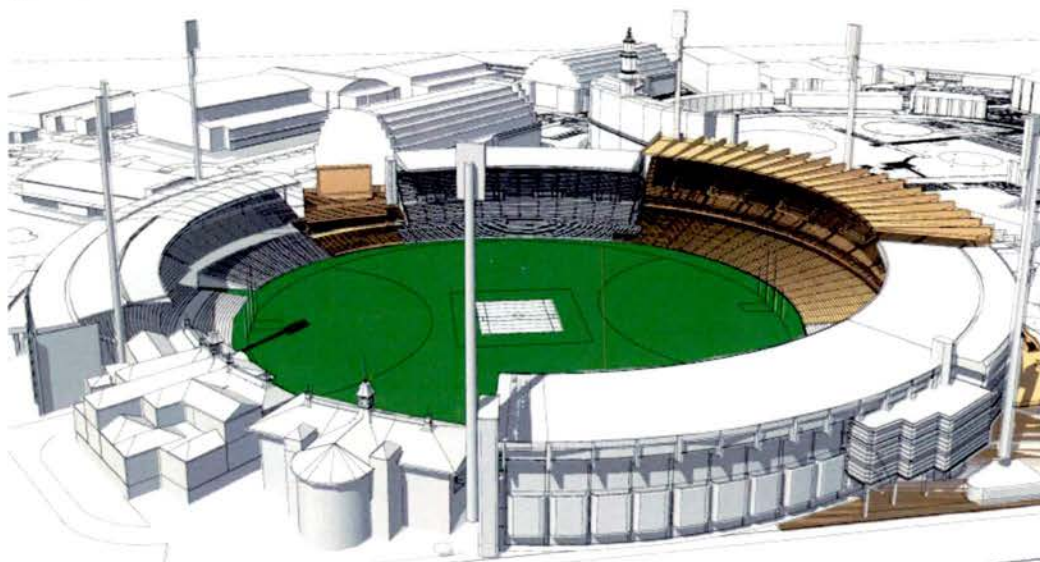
Axonometric Plan (Source BBC Consulting Planners)
